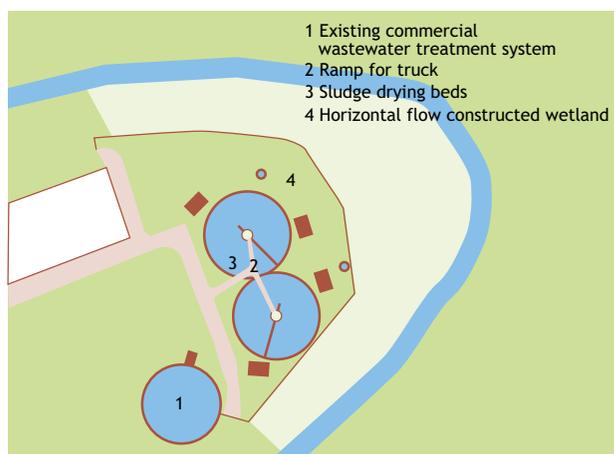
Proposed lay-out for a faecal sludge treatment plant with unplanted sludge drying beds. The beds are laid out in a circular design with one inlet. The leachate is to be treated in horizontal flow constructed wetlands (HPCIDBC, 2011).
